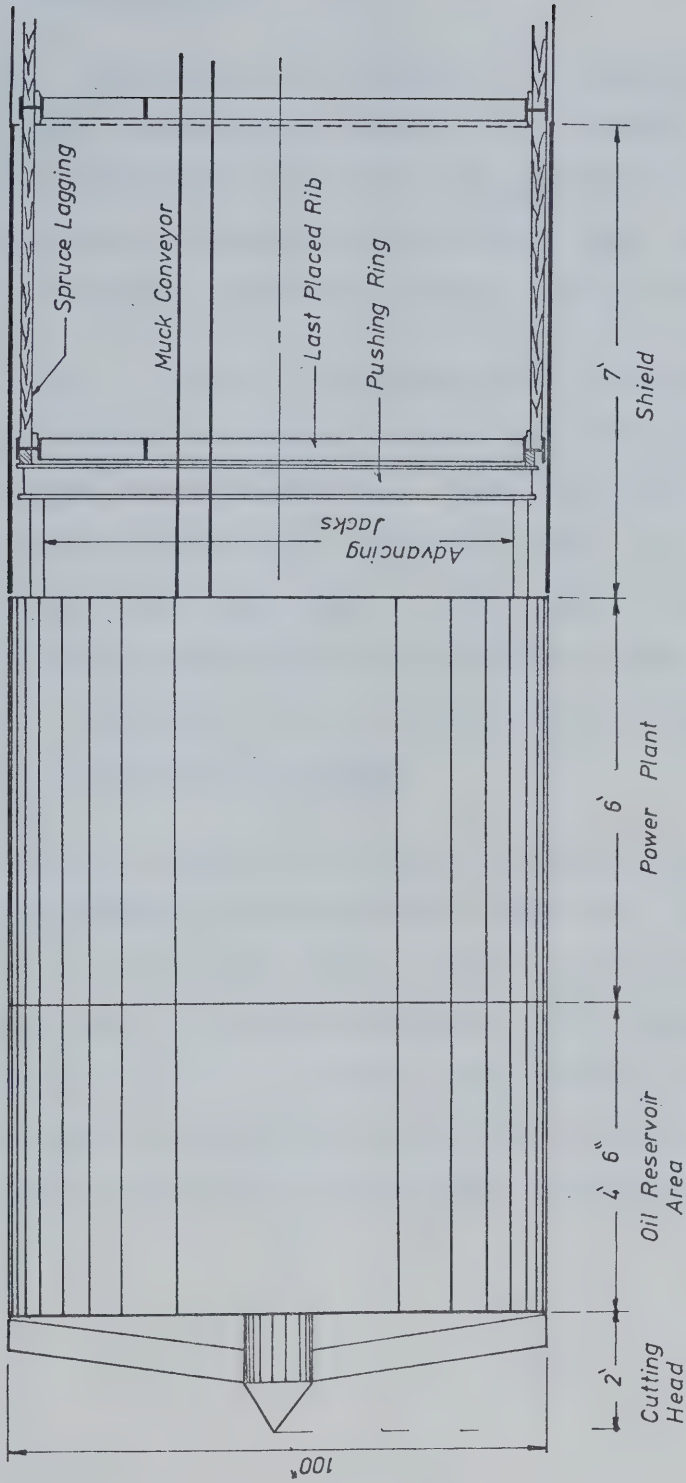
Mole and Shield Used in the 170th Street Tunnel.
